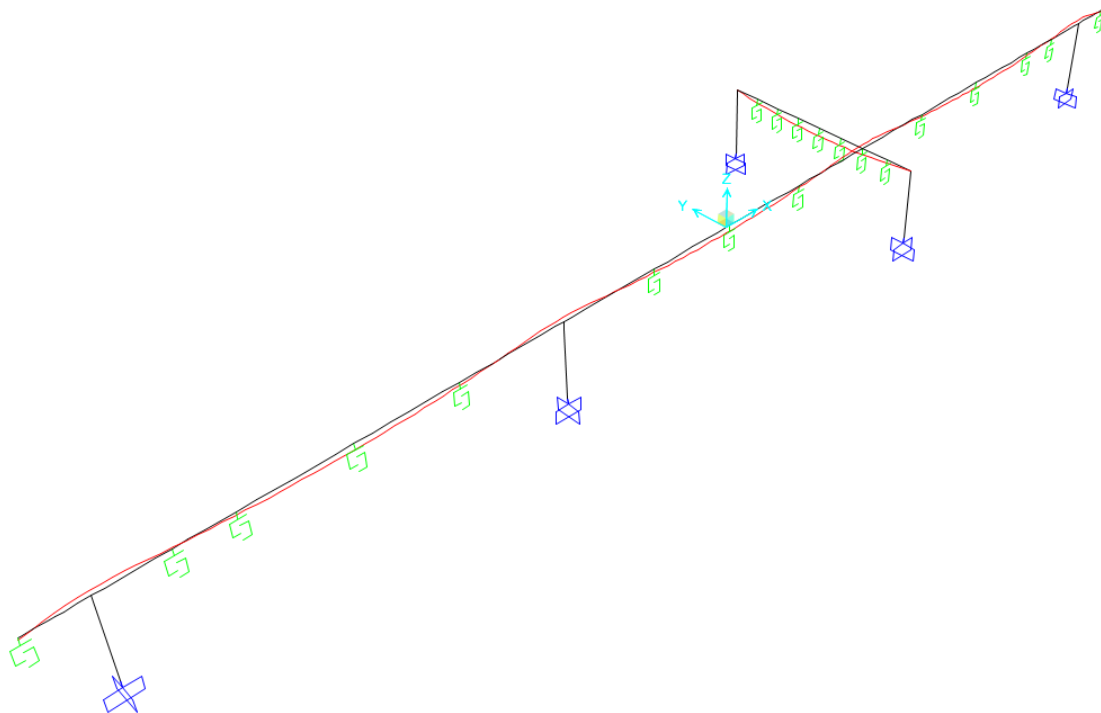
3-D view of SAP2000 model for Frame 2, Bridge 2
